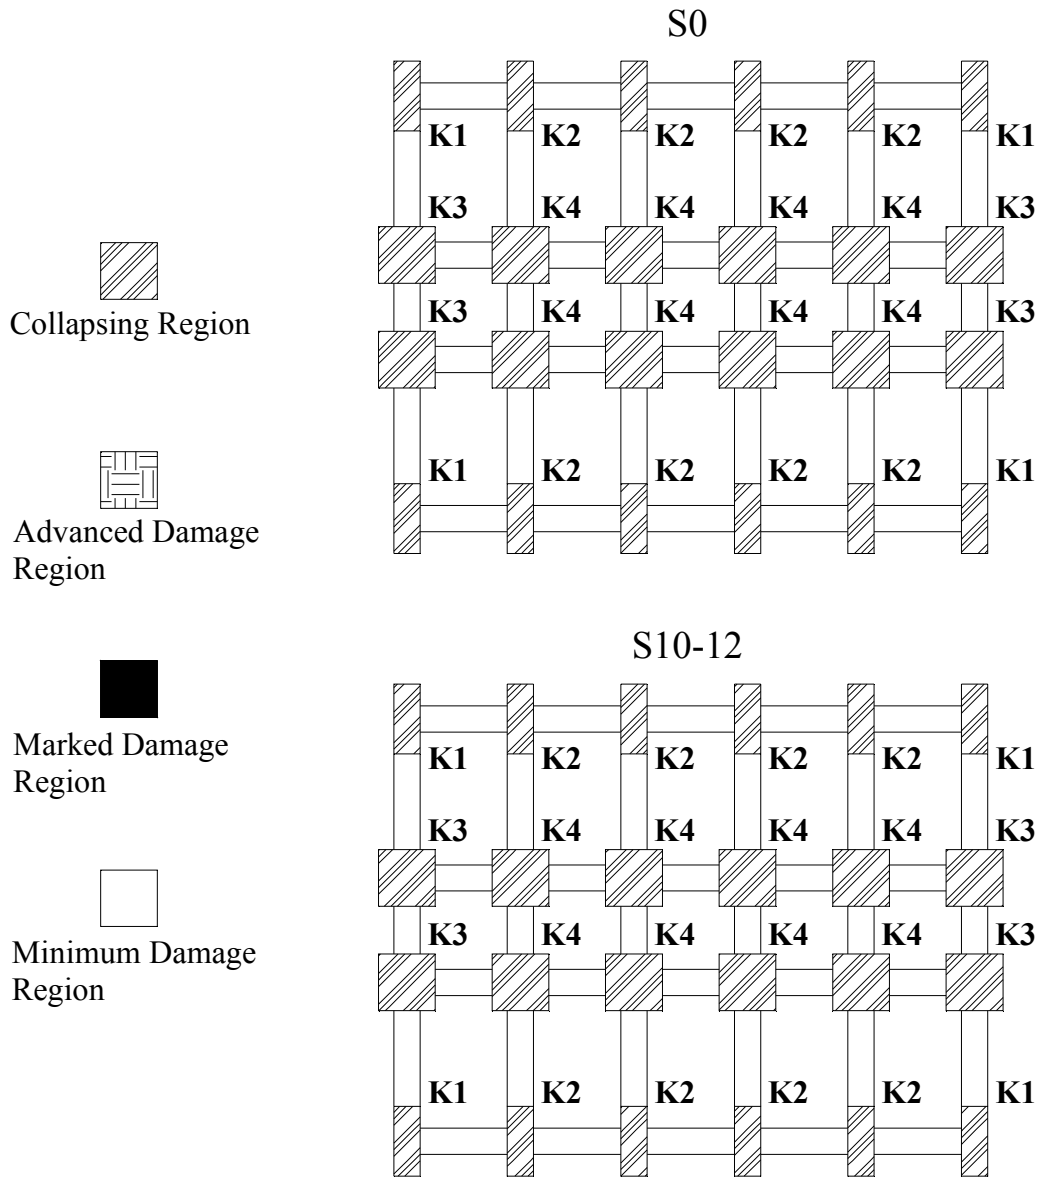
The view of damage levels of base columns of S0 ve S10-12 buildings on plan for KOBE, 1995.
